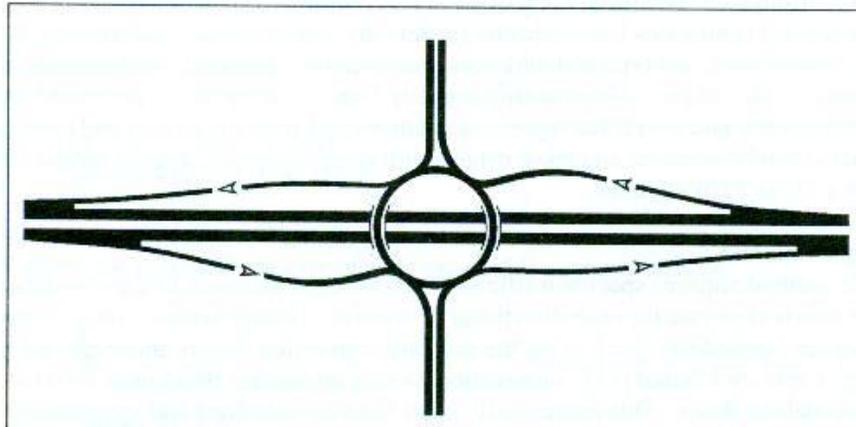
Diamond Interchange with Roundabout at Single Ramp Terminal Intersection
